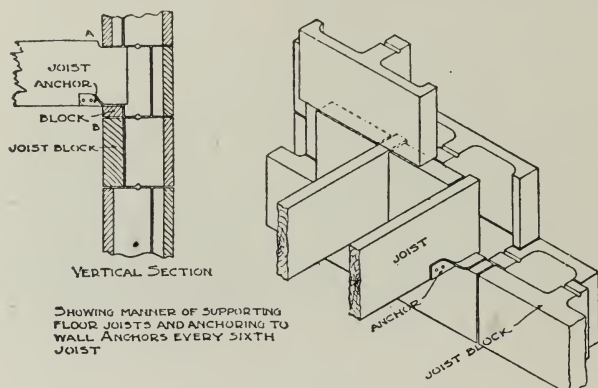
Two-piece Concrete Blocks. Joist Supports.
